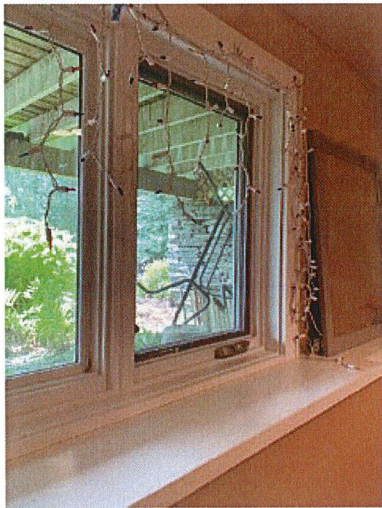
The basement bedroom window will not open. It was stuck shut the day of inspection.
